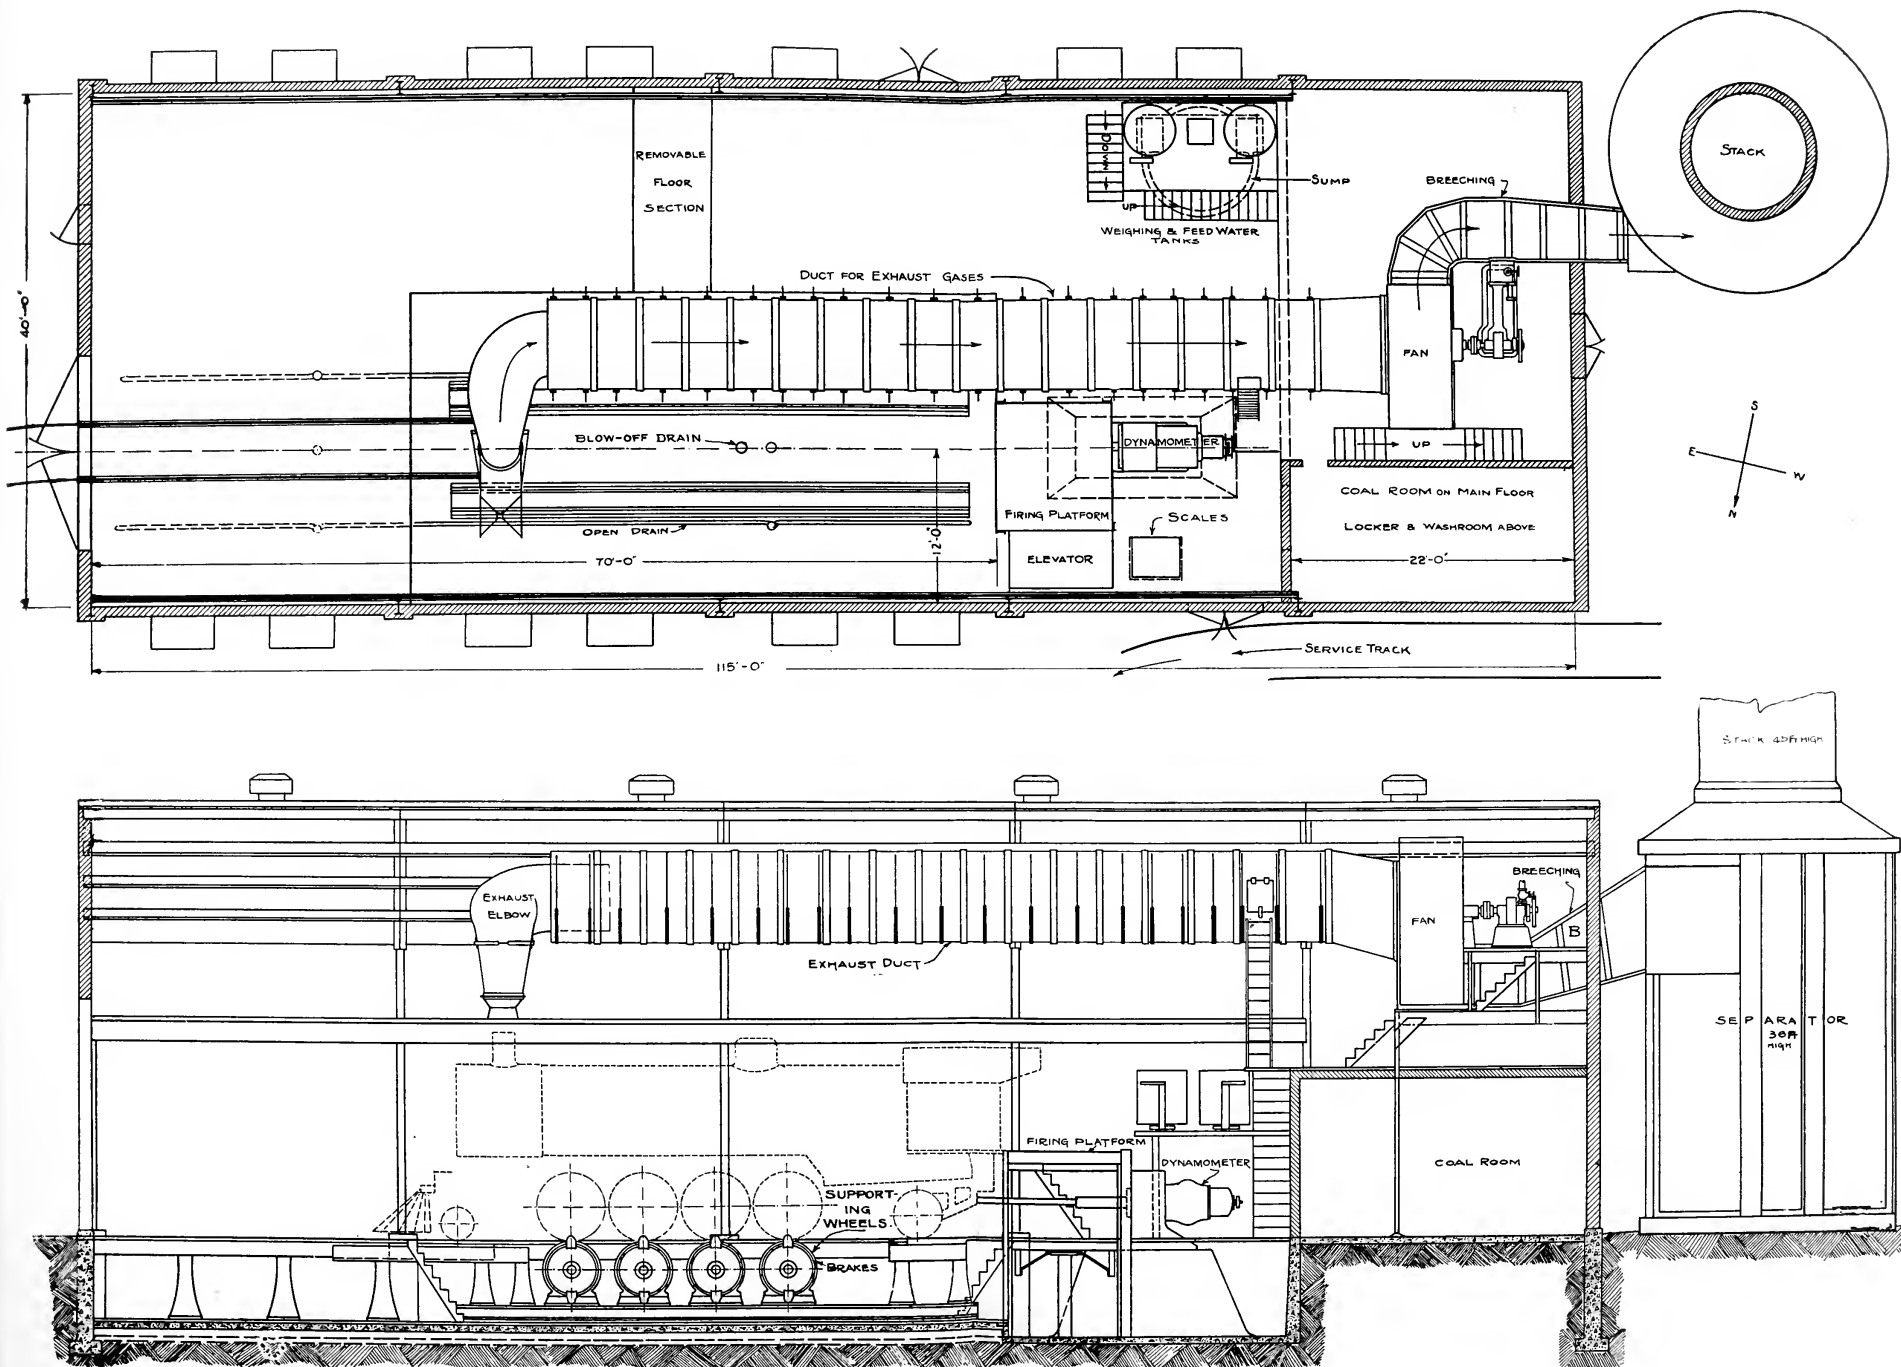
SECTIONAL PLAN AND ELEVATION OF THE LABORATORY.
